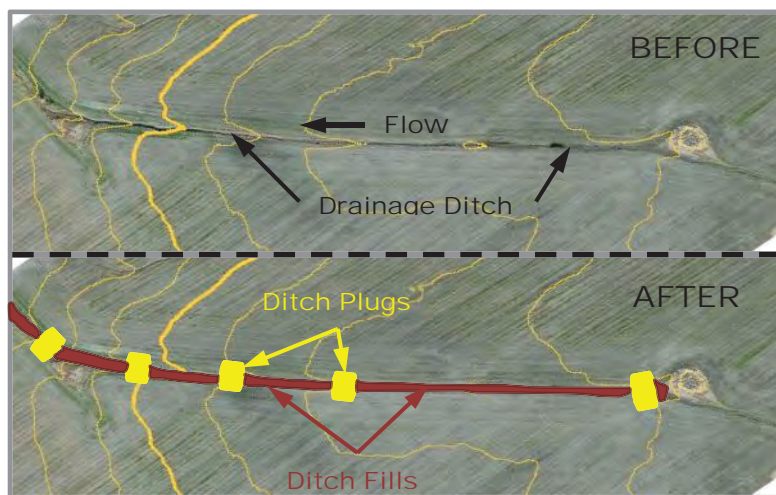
Ditch Plug/Fill Design for Sloped Wetland Setting – 2 Foot Contours
